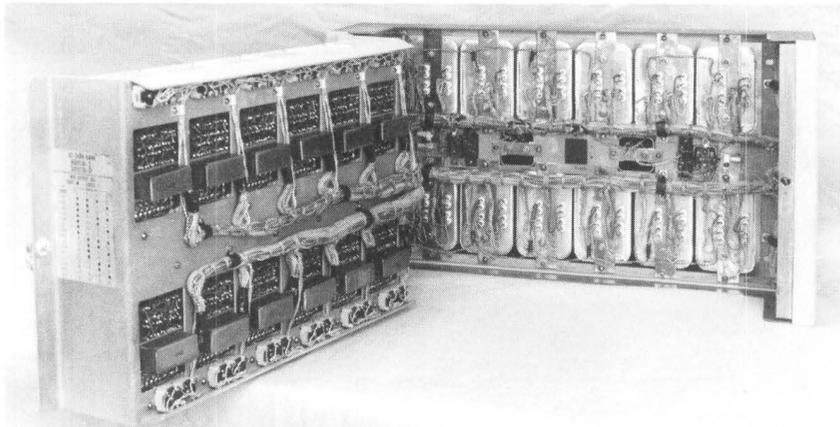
The crystal channel filter assembly for the A5 channel bank. Careful shielding and component placement made it possible to place the transmitting and receiving unit in the same container.
